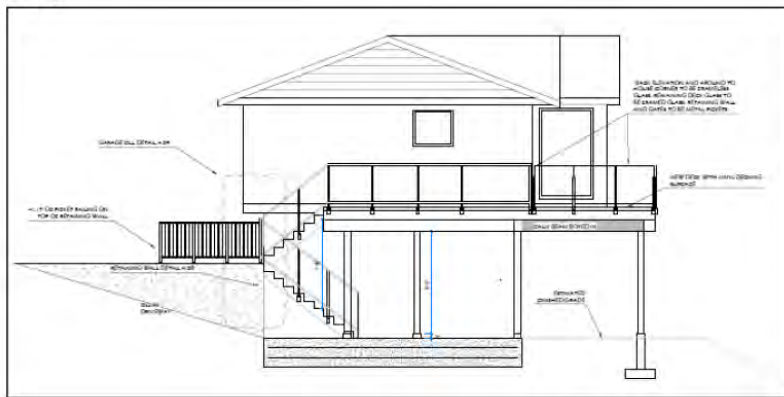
Side view of the building and proposed deck expansion. Drawings provided by Momentum Design Build.
